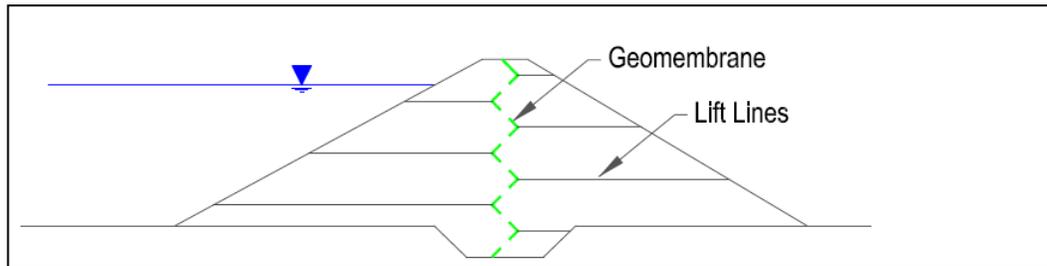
Seepage barrier using geomembrane in lift construction.
